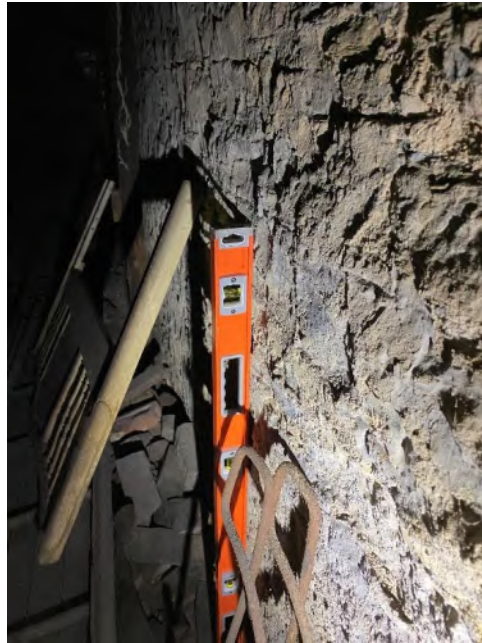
Existing Floor Shoring, Left Foundation Wall
